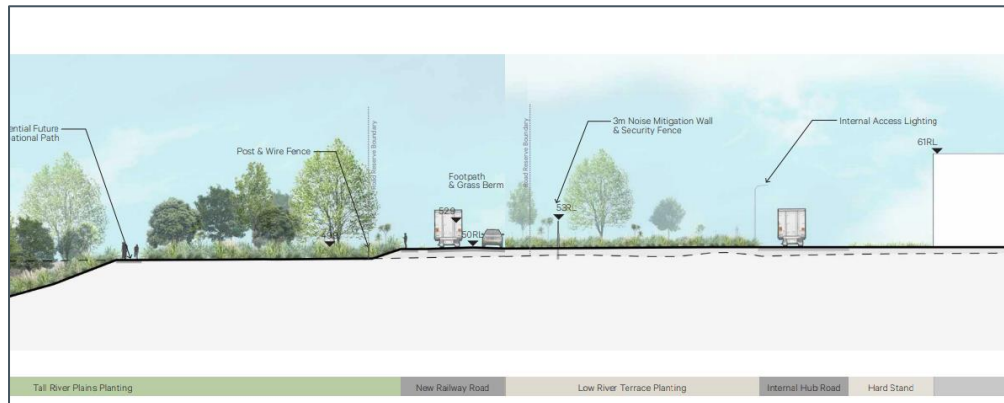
Extract from Landscape Evidence² showing Perimeter Road and Noise Barrier.
